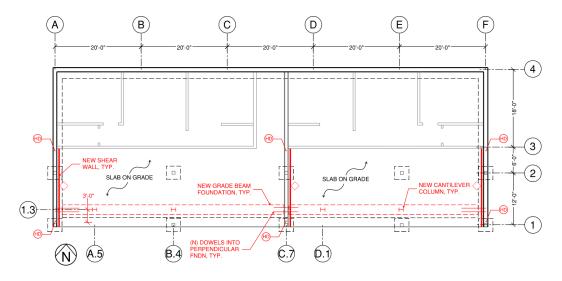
First-story plan showing wood-structural-panel shear wall locations in addition to steel cantilever columns.
